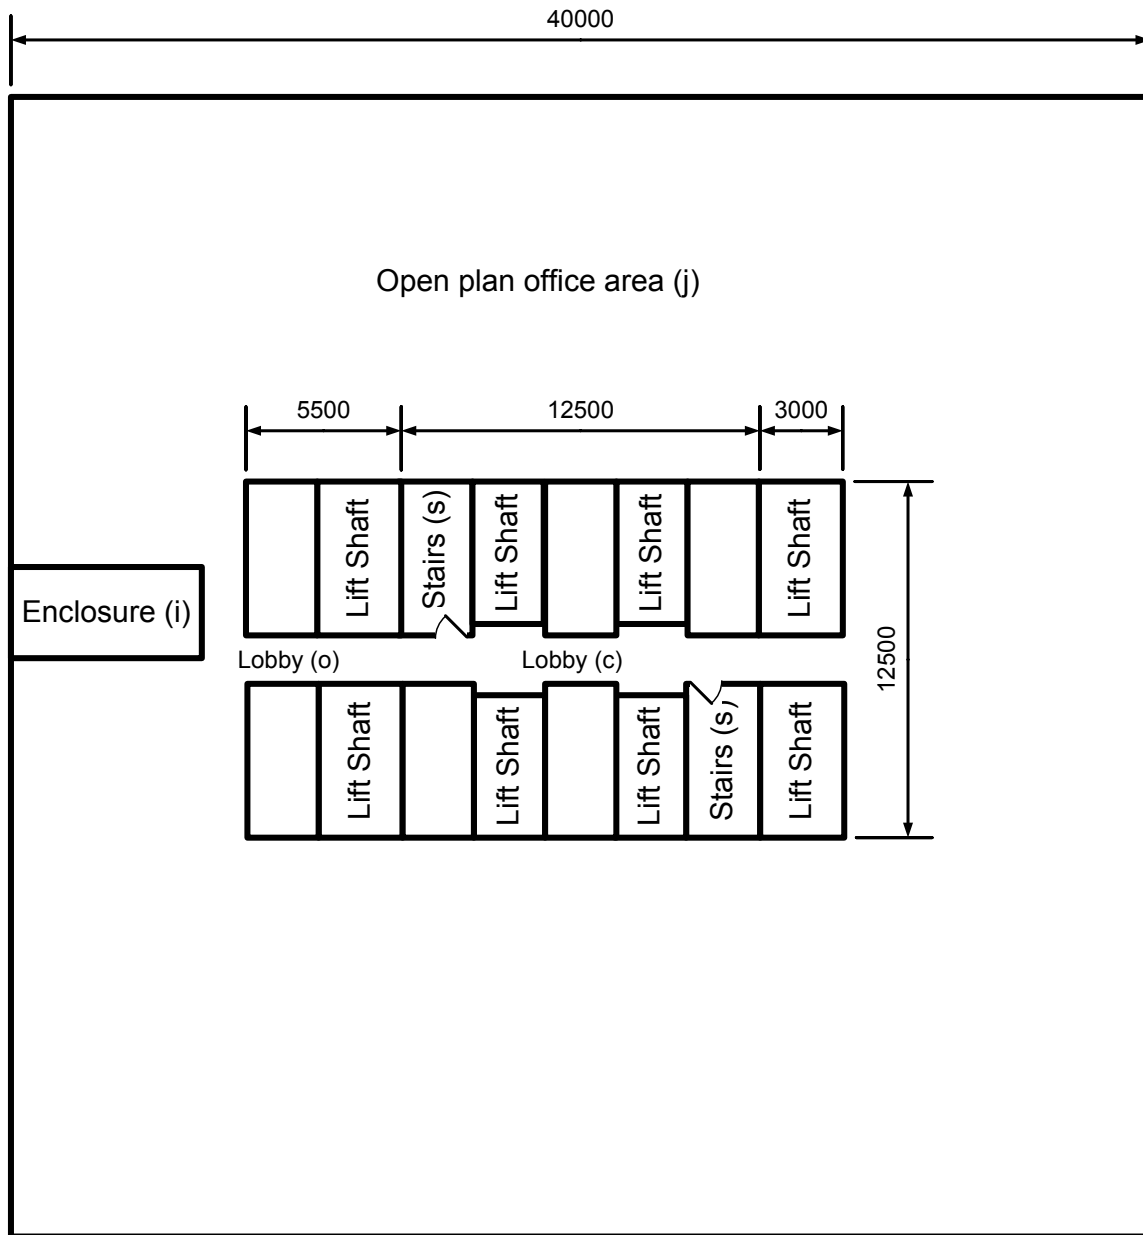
140 William Street building typical plan view, from Thomas et al^[24]. Dimensions in mm.
